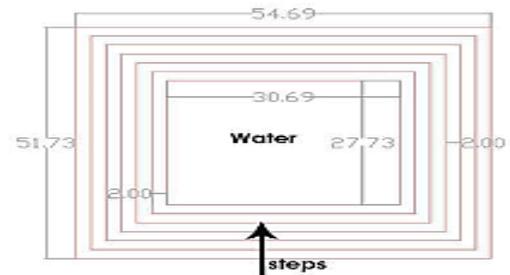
Plan of Proposed Kalyani (Immersion Tank)
